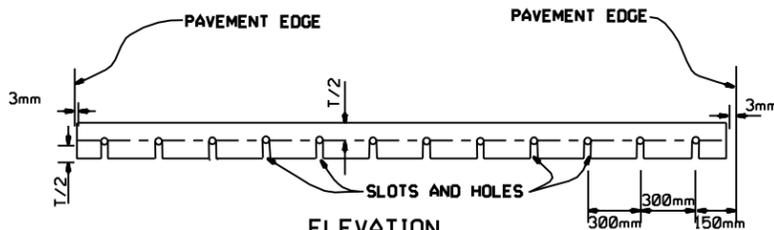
DETAIL OF JOINT SUPPORT FOR EXPANSION JOINTS
